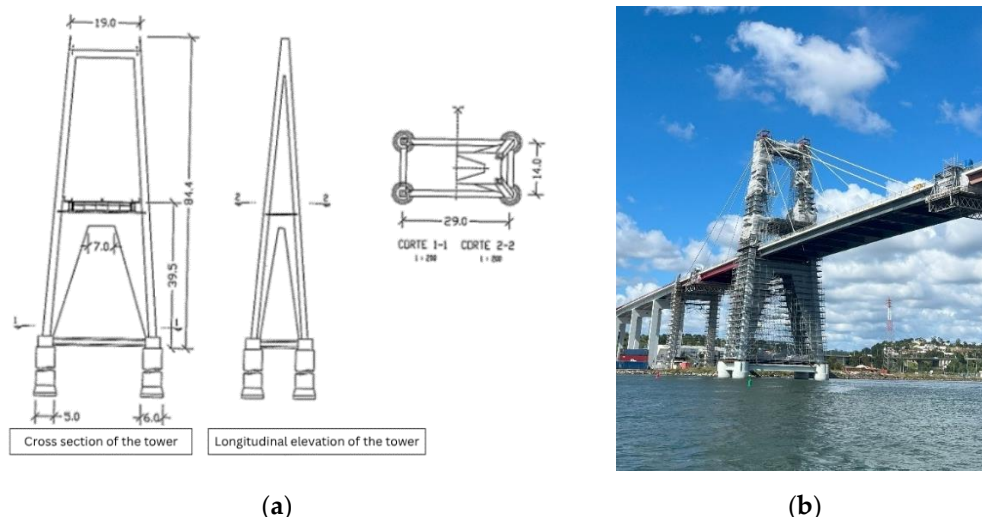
(a) Geometry and dimensions of the Figueira da Foz Bridge towers; (b) Photograph of the north bridge tower under rehabilitation.
